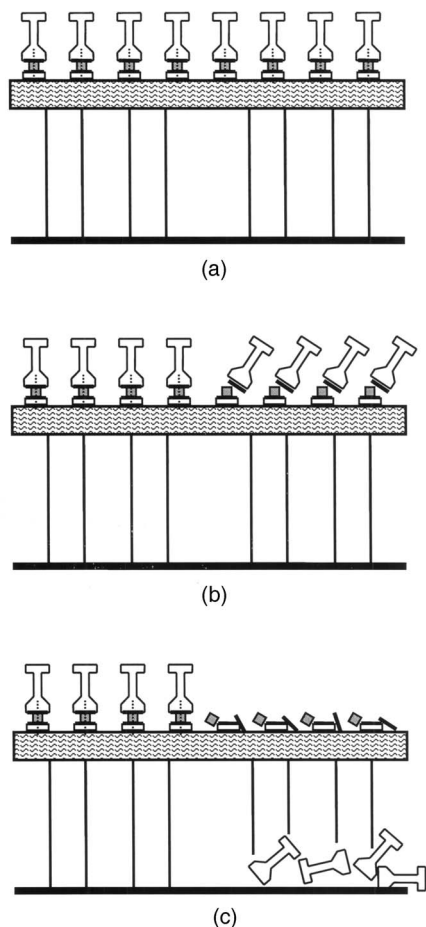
Girders failure [adapted from MTQ (2000)]
